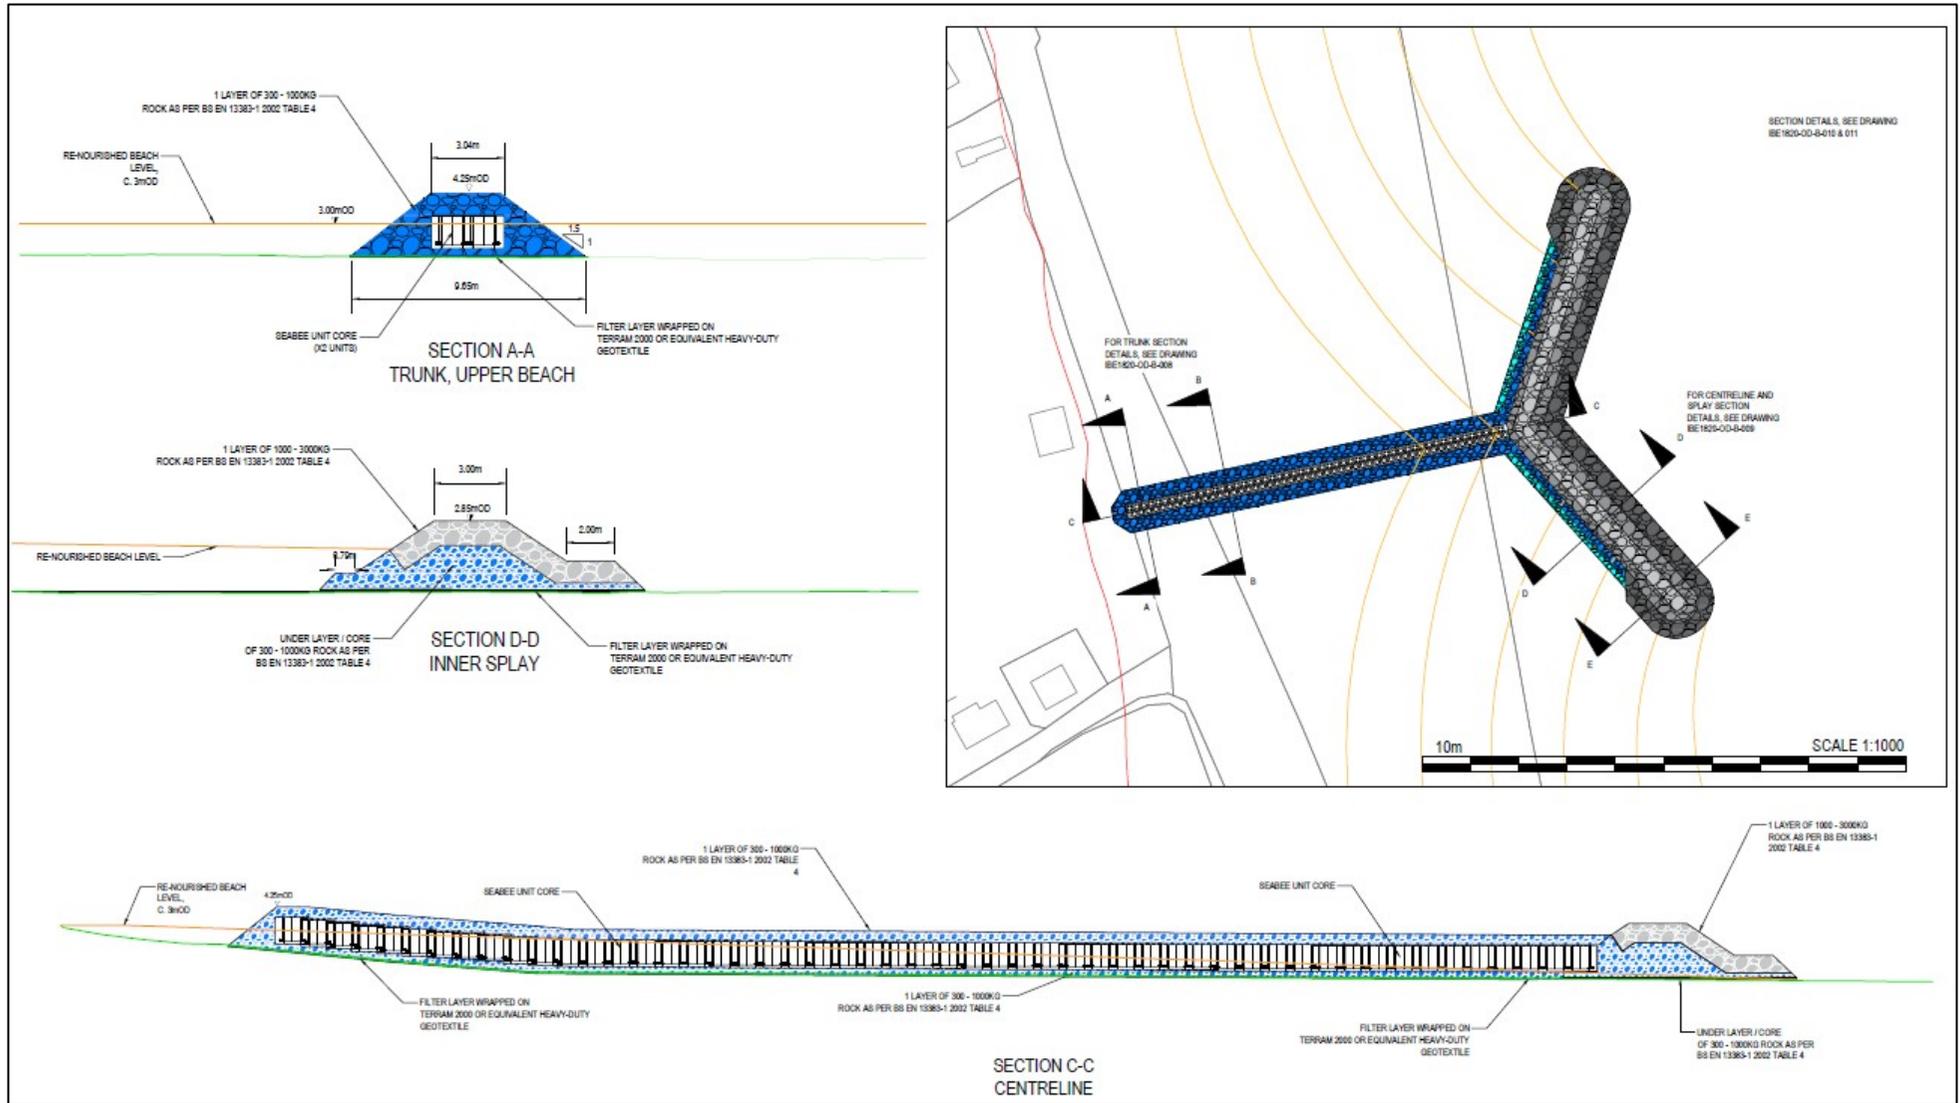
Cross section of a typical fish-tail groyne structure and beach nourishment level
